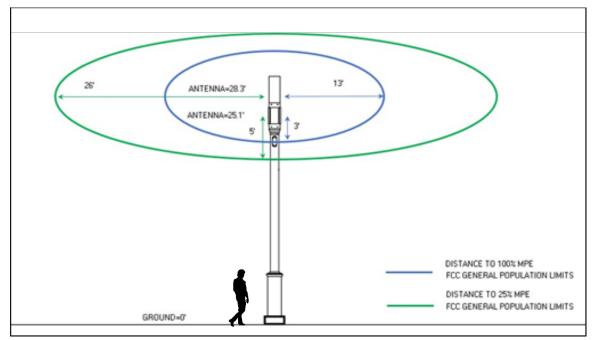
(Example of) Elevation Depiction of the Proposed Equipment Emissions
